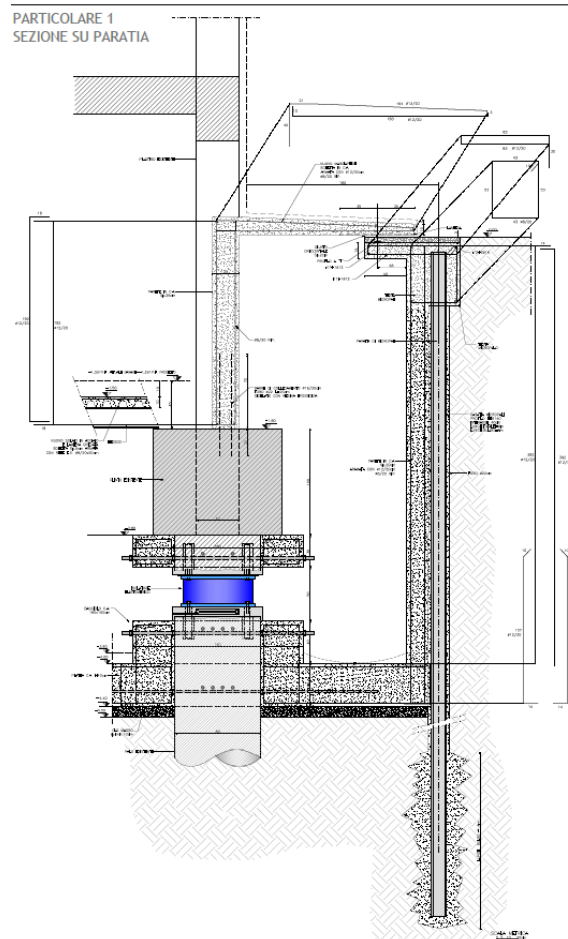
Cross section of the building in via Di Vincenzo 23 A: detail of the perimeter retaining wall and of an isolator installed on the perimeter of the building.
